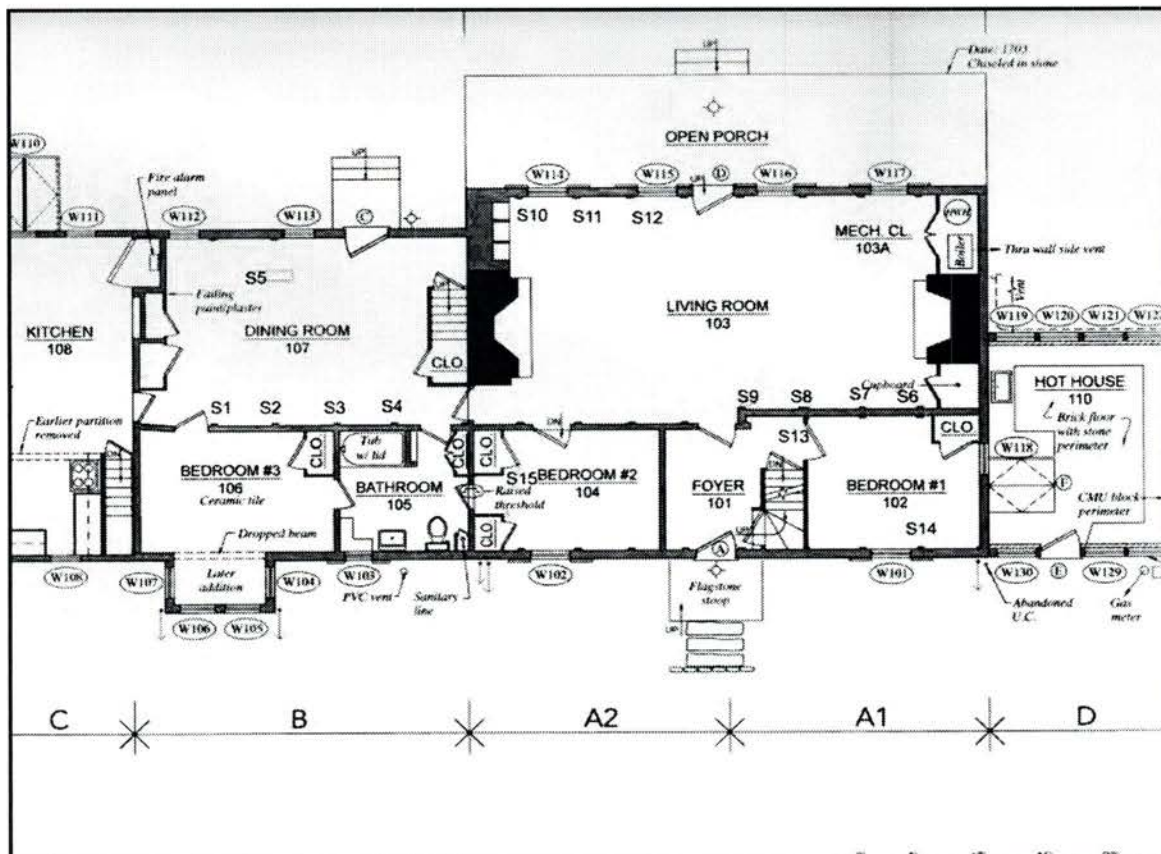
Plan view of the Van Wickle House samples are designated S1, S2, etc.
